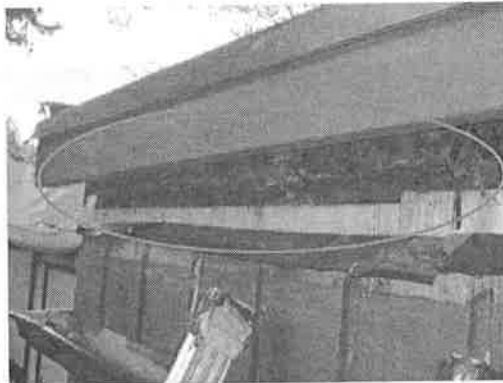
East Elevation Roof Curb and Wall Framing Below Fascia At The Low Slope Roof Area
